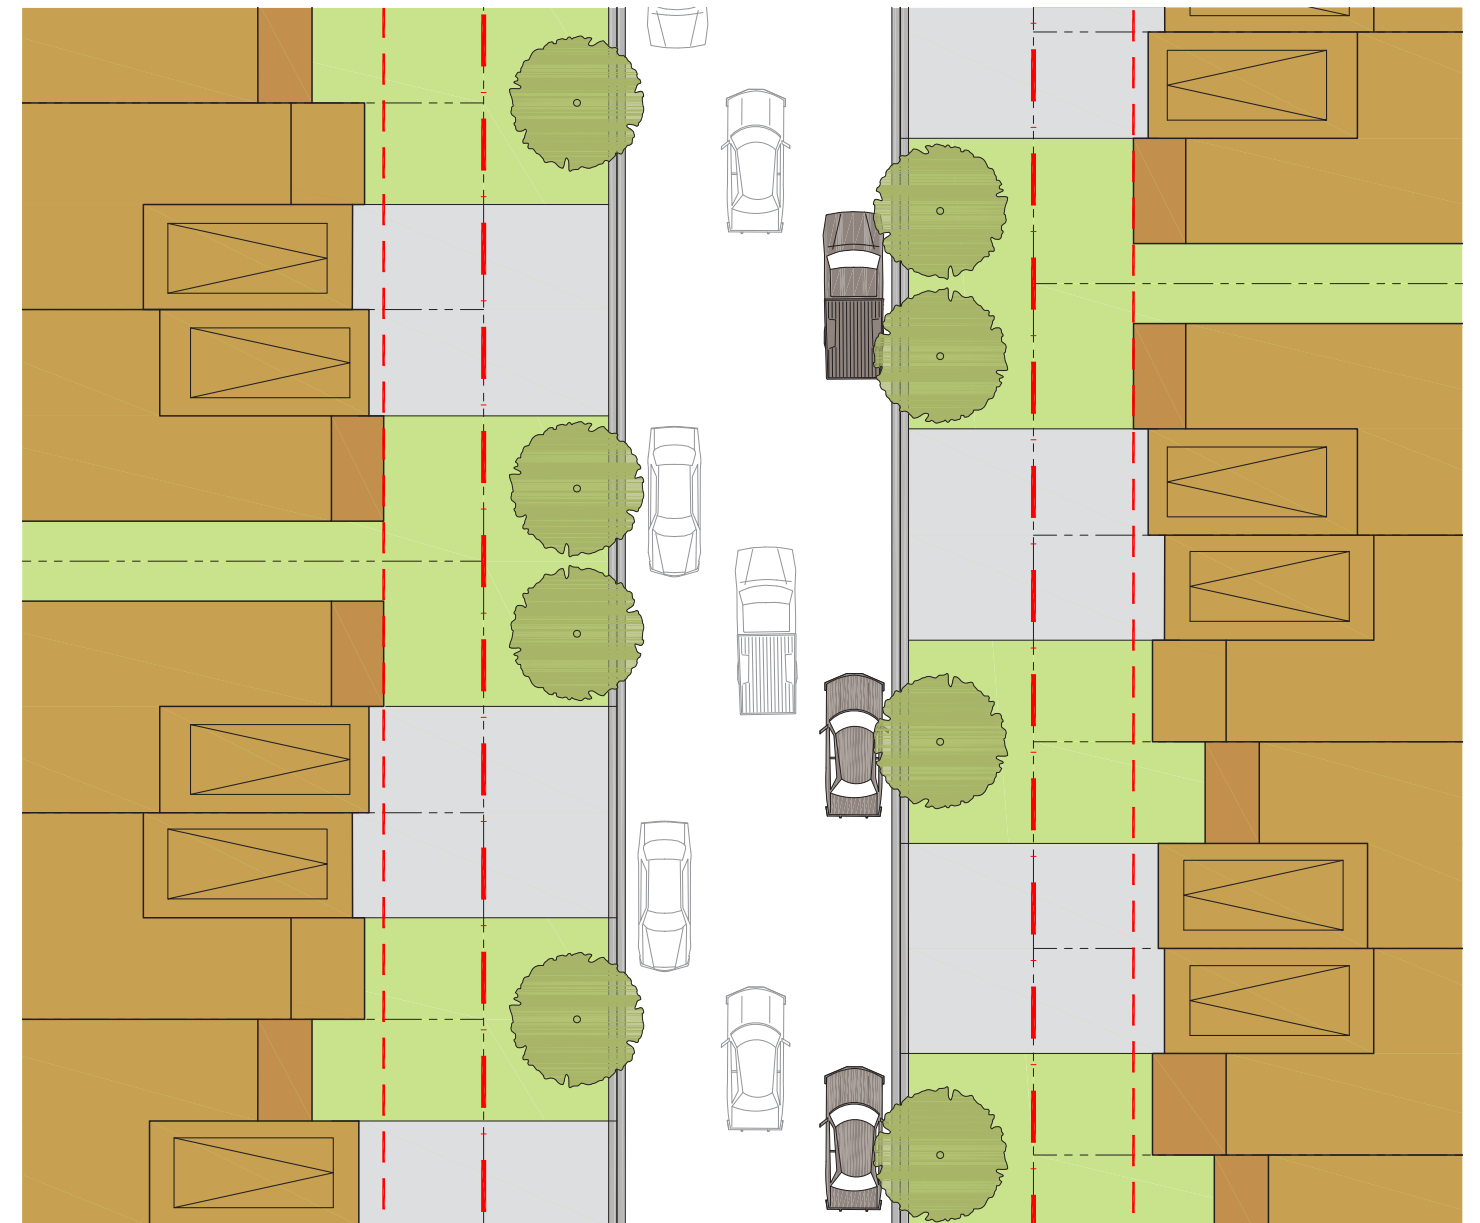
Front Drive Townhomes On-Street Parking Configuration
